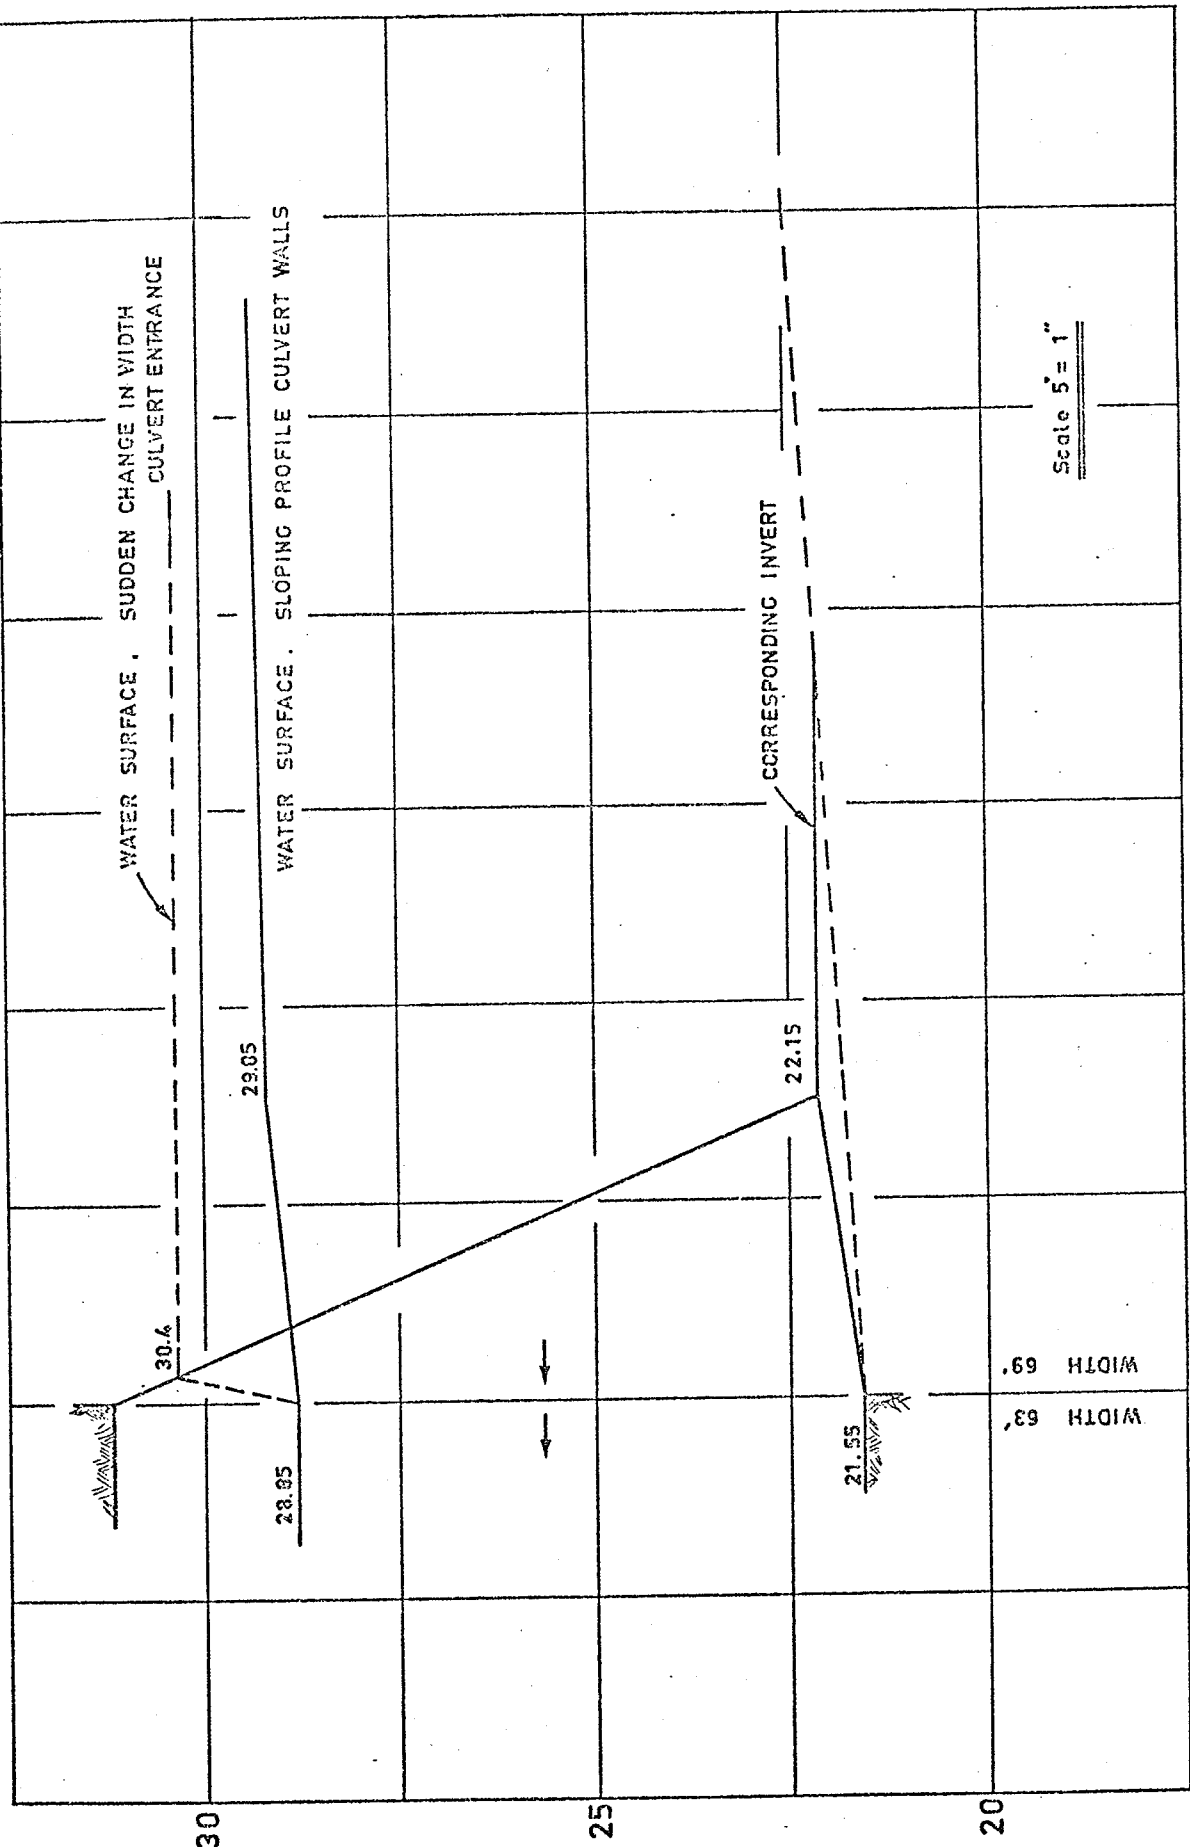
CULVERT WALL NOSE - S.E. FREEWAY
